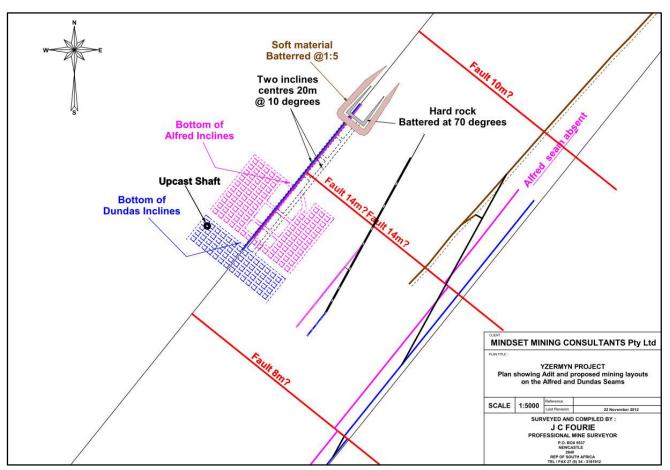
Plan Illustrating Adit and Proposed Mining Layouts of the Alfred and Dundas Coal Seams
